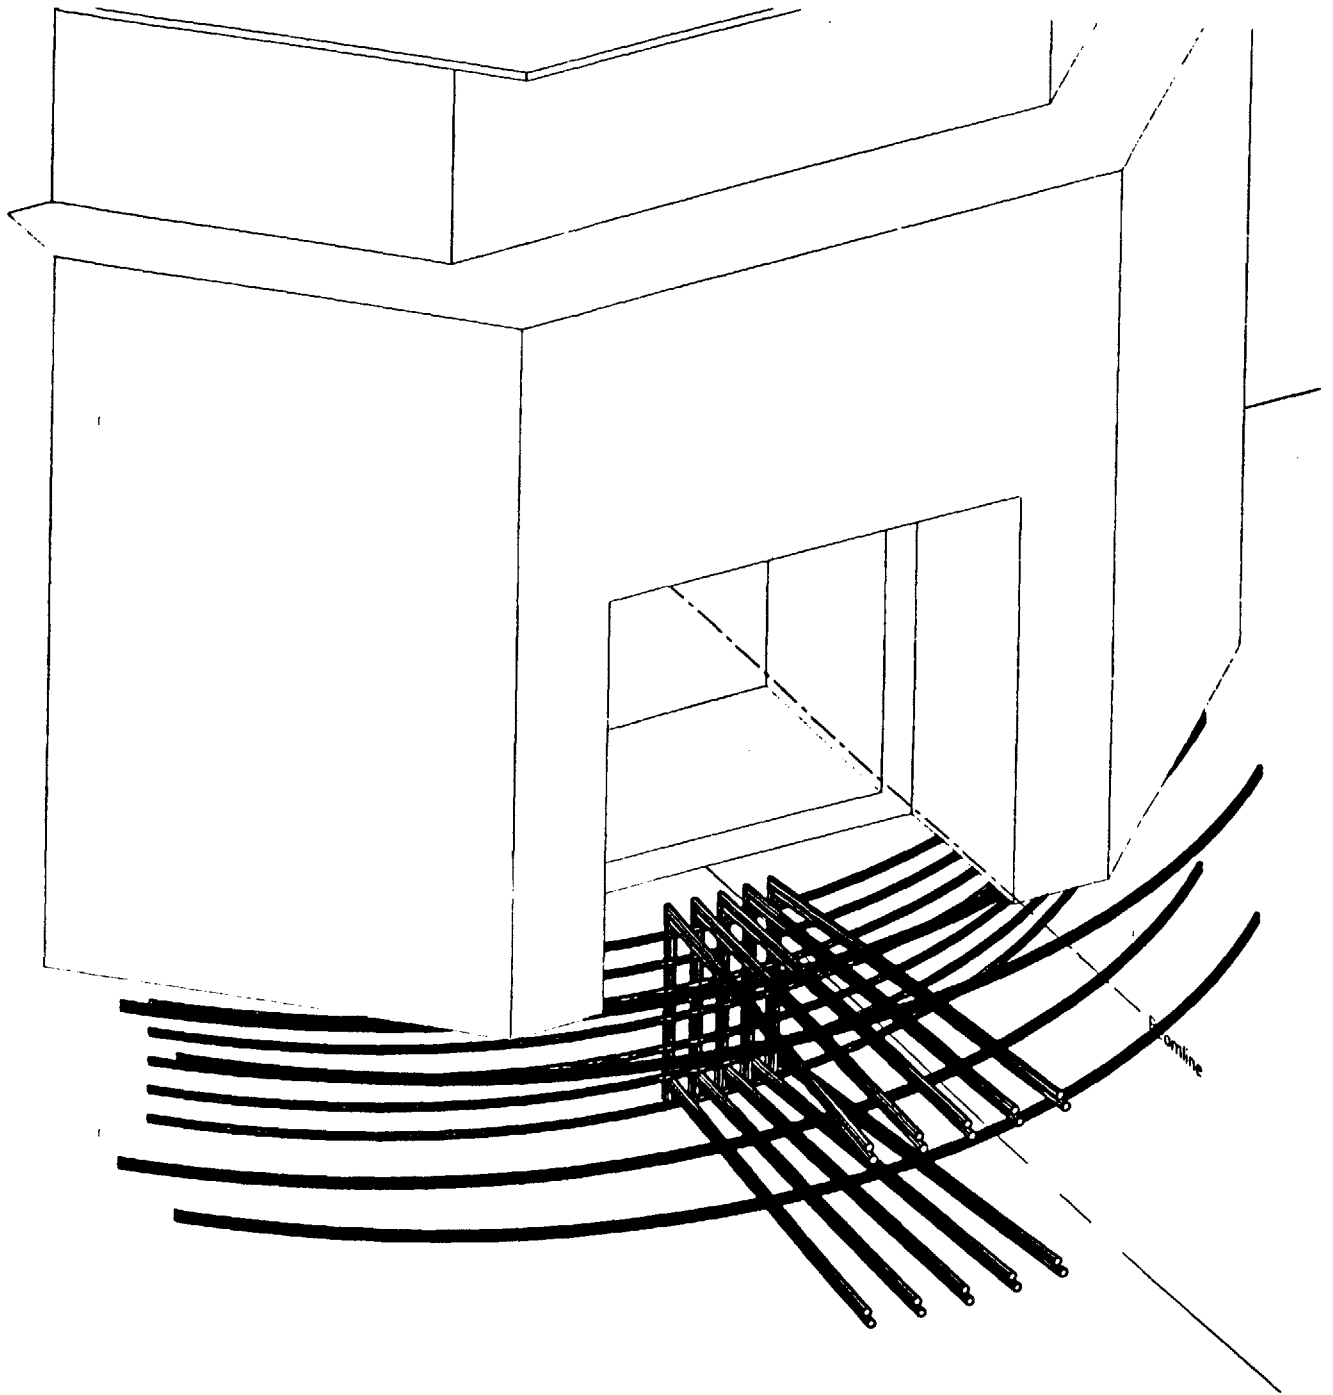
Sections of Reactor Floor Steel Reinforcement Bars.
